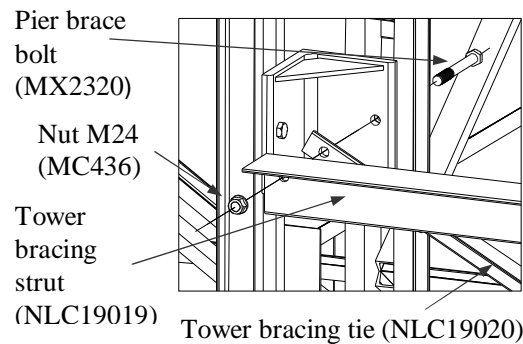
Tower bracing tie, tower bracing strut and angle bracket connection.
